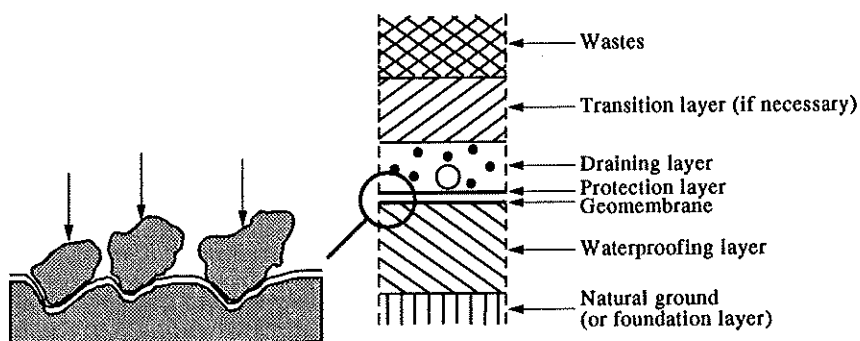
Cross-section of a classical waterproofing drainage system for landfills.
